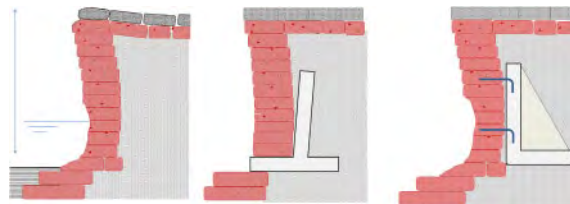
(a) Original structure, (b) RC-retaining wall (EFEO) and (c) RC-retaining wall (Sophia Univ.).
